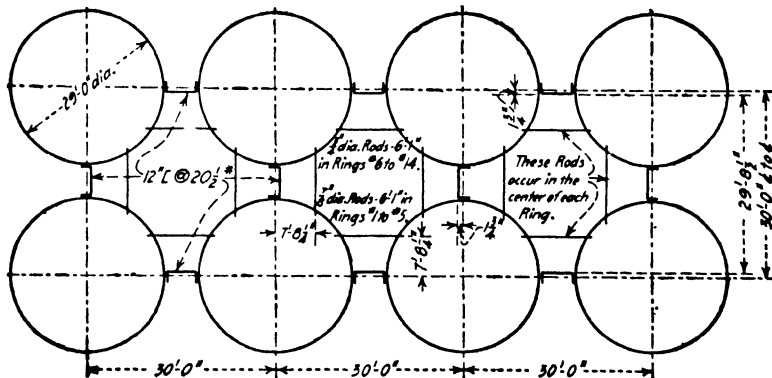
PLAN OF STEEL STORAGE BINS FOR A STEEL ELEVATOR.
